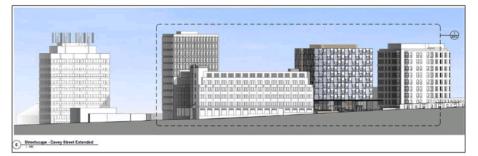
Western section of the proposed building in context with adjoining buildings (source: X-Squared Architects)
